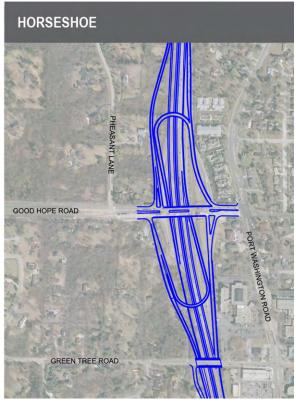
Good Hope Road Interchange Build Alternatives (continued)
